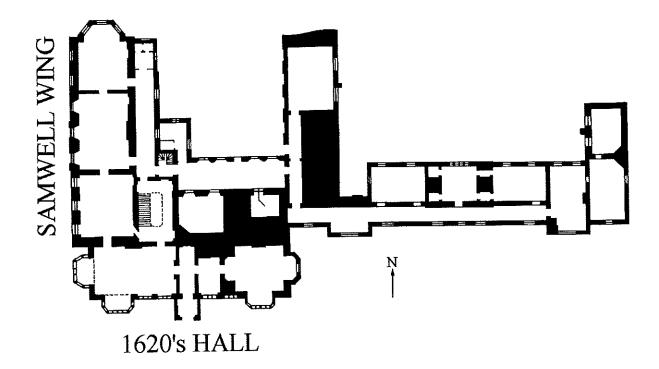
Plan of Felbrigg Hall, showing the Samwell wing (after Maddison 1995)
